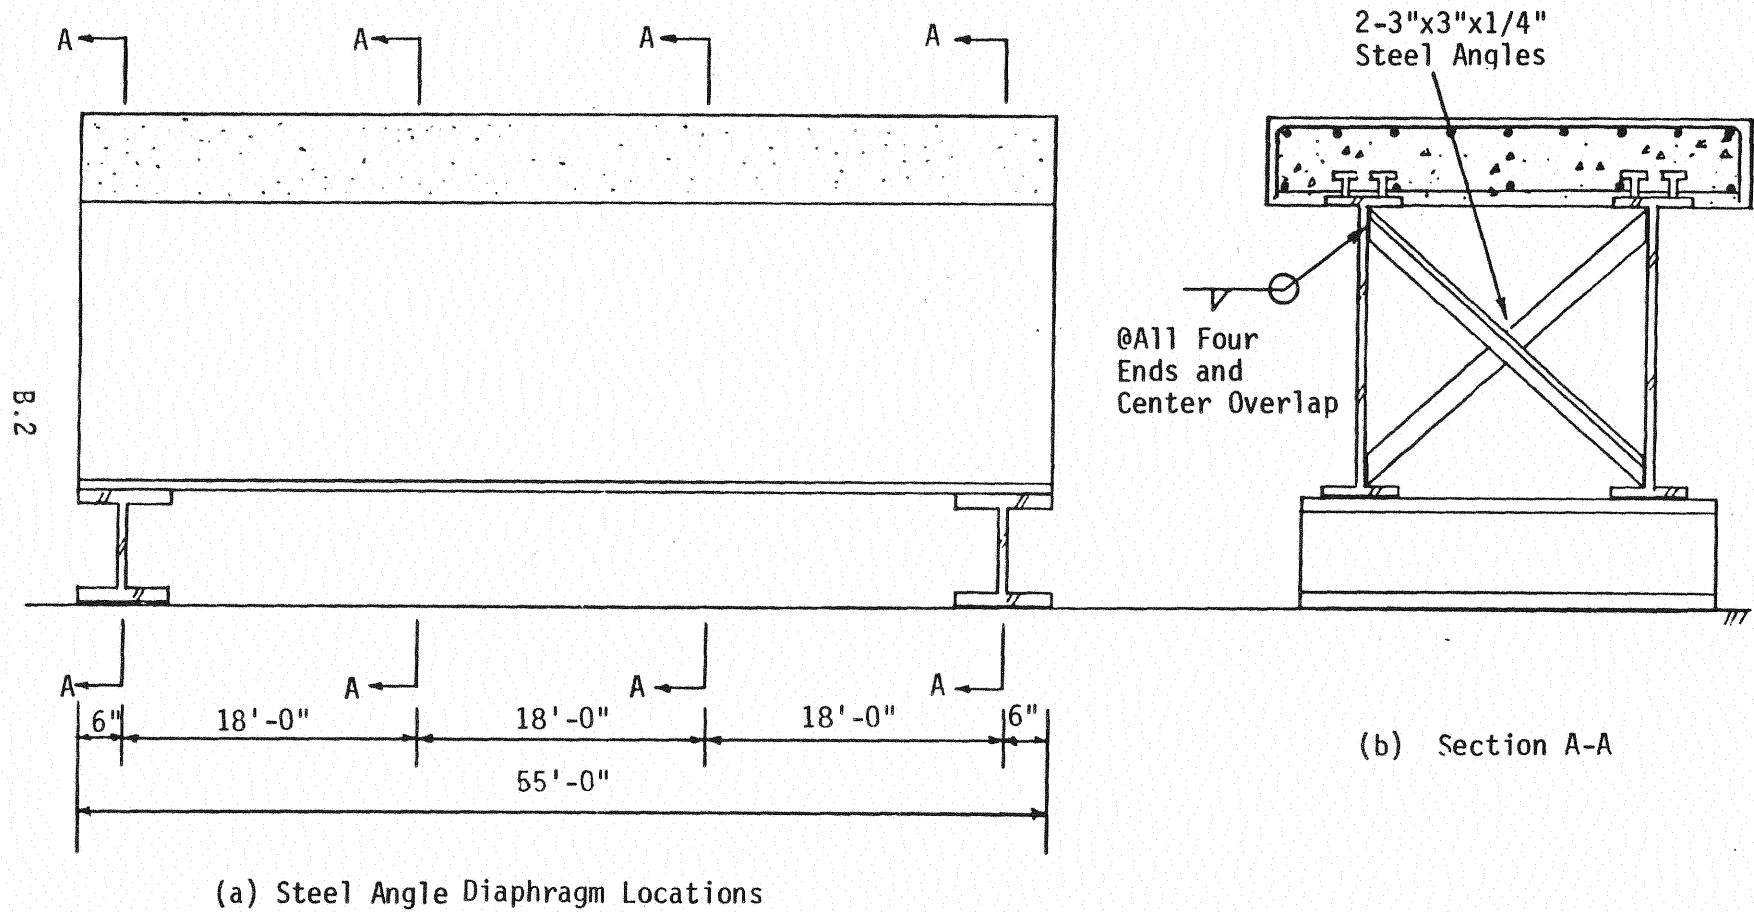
Cross-Frame Diaphragm Locations on Bridge Units
